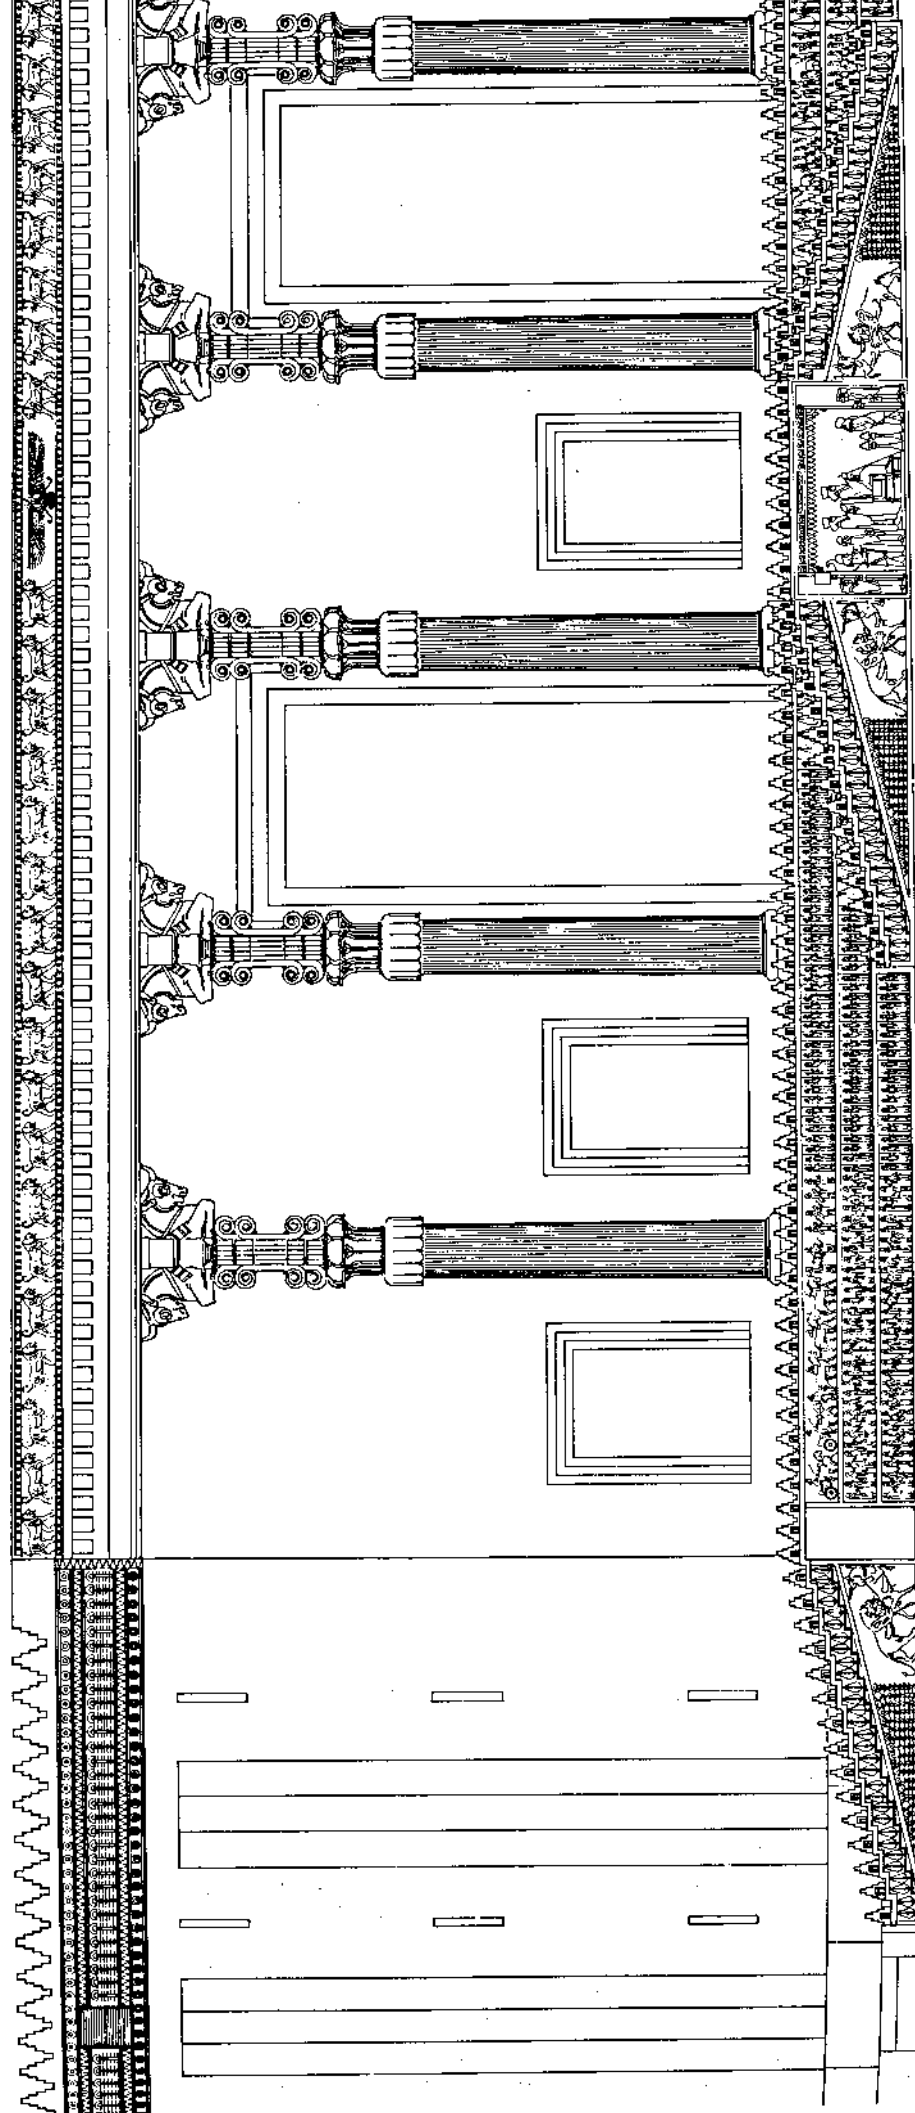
Apadana : Reconstruction of North Stair Facade with Original Central Panel.
